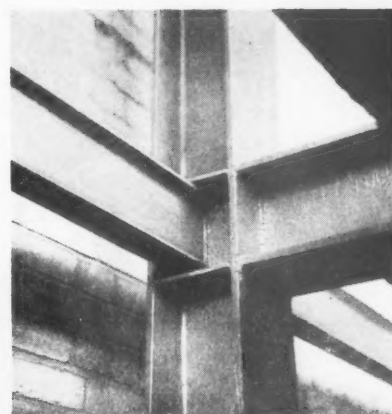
Example of the type of welded detail achieved by the plastic design method. The main frame in a film-storage building of five storeys, one of the few multi-storey buildings yet designed by this method. Consulting engineers: R. T. James and Partners
